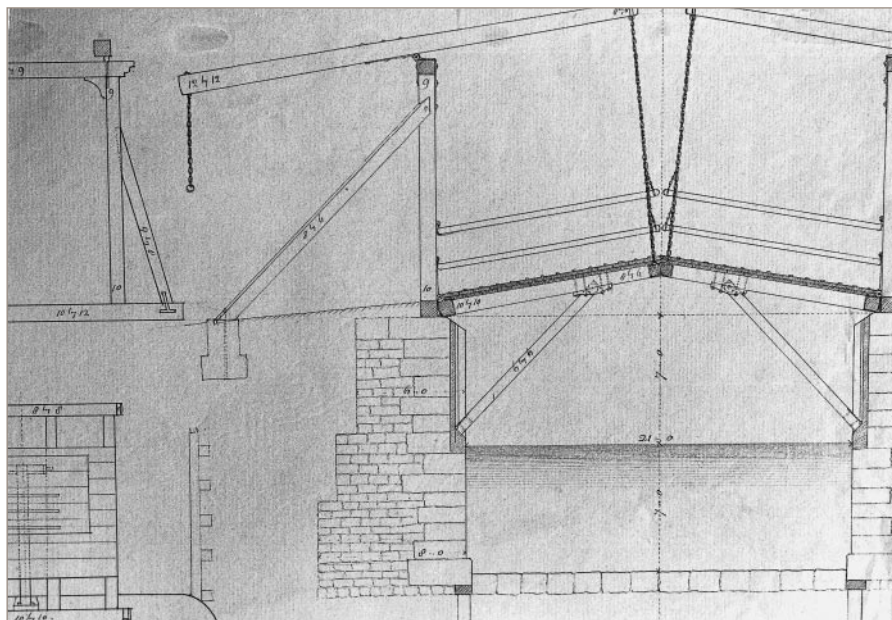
Typical two-leaf drawbridge over the Forth & Clyde Canal.<sup>34</sup> None of the 33 original timber bridges remain.
